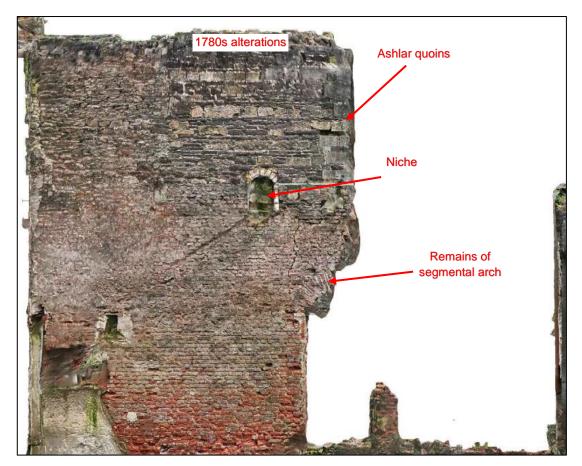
South wall of West Stair Hall, second and third floors of Cell F
